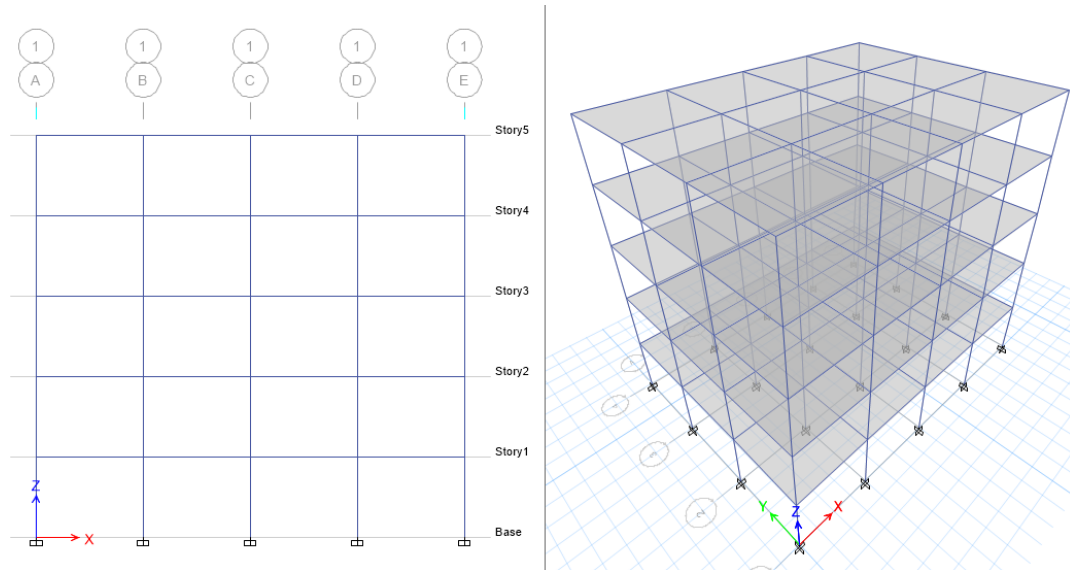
The 5-story building with moment-resisting frame and without shear walls.
